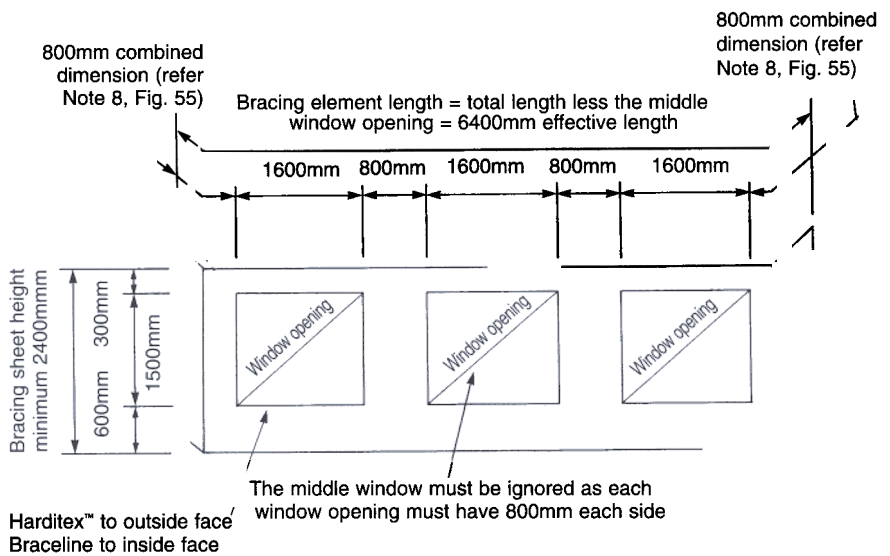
HARDITEX™ / BRACELINE WINDOW OPENING PANEL – PANEL WITH TWO WINDOWS
